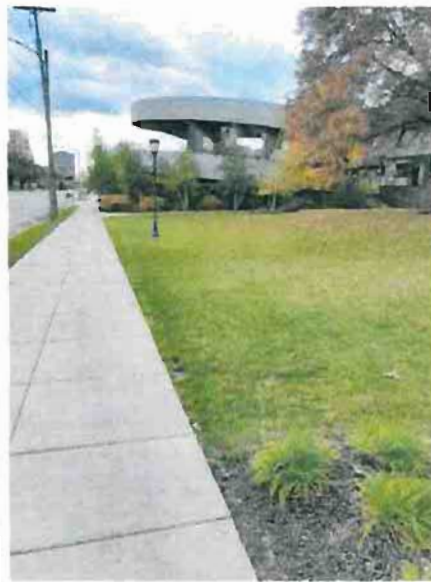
West Side Gannon Deck – looking south at helix exit ramp
